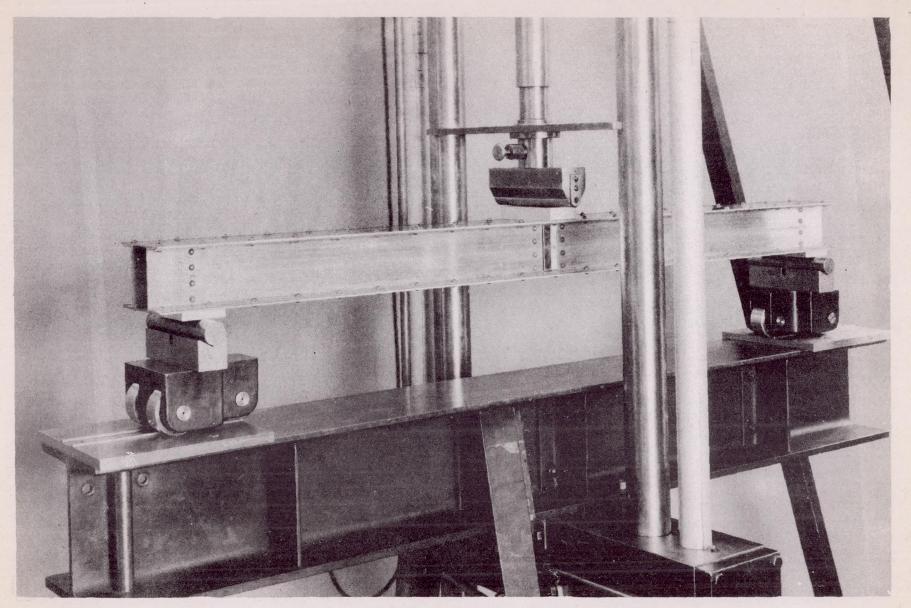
Static test of riveted girder built up of 615-T sheet 1/8 inch thick.
